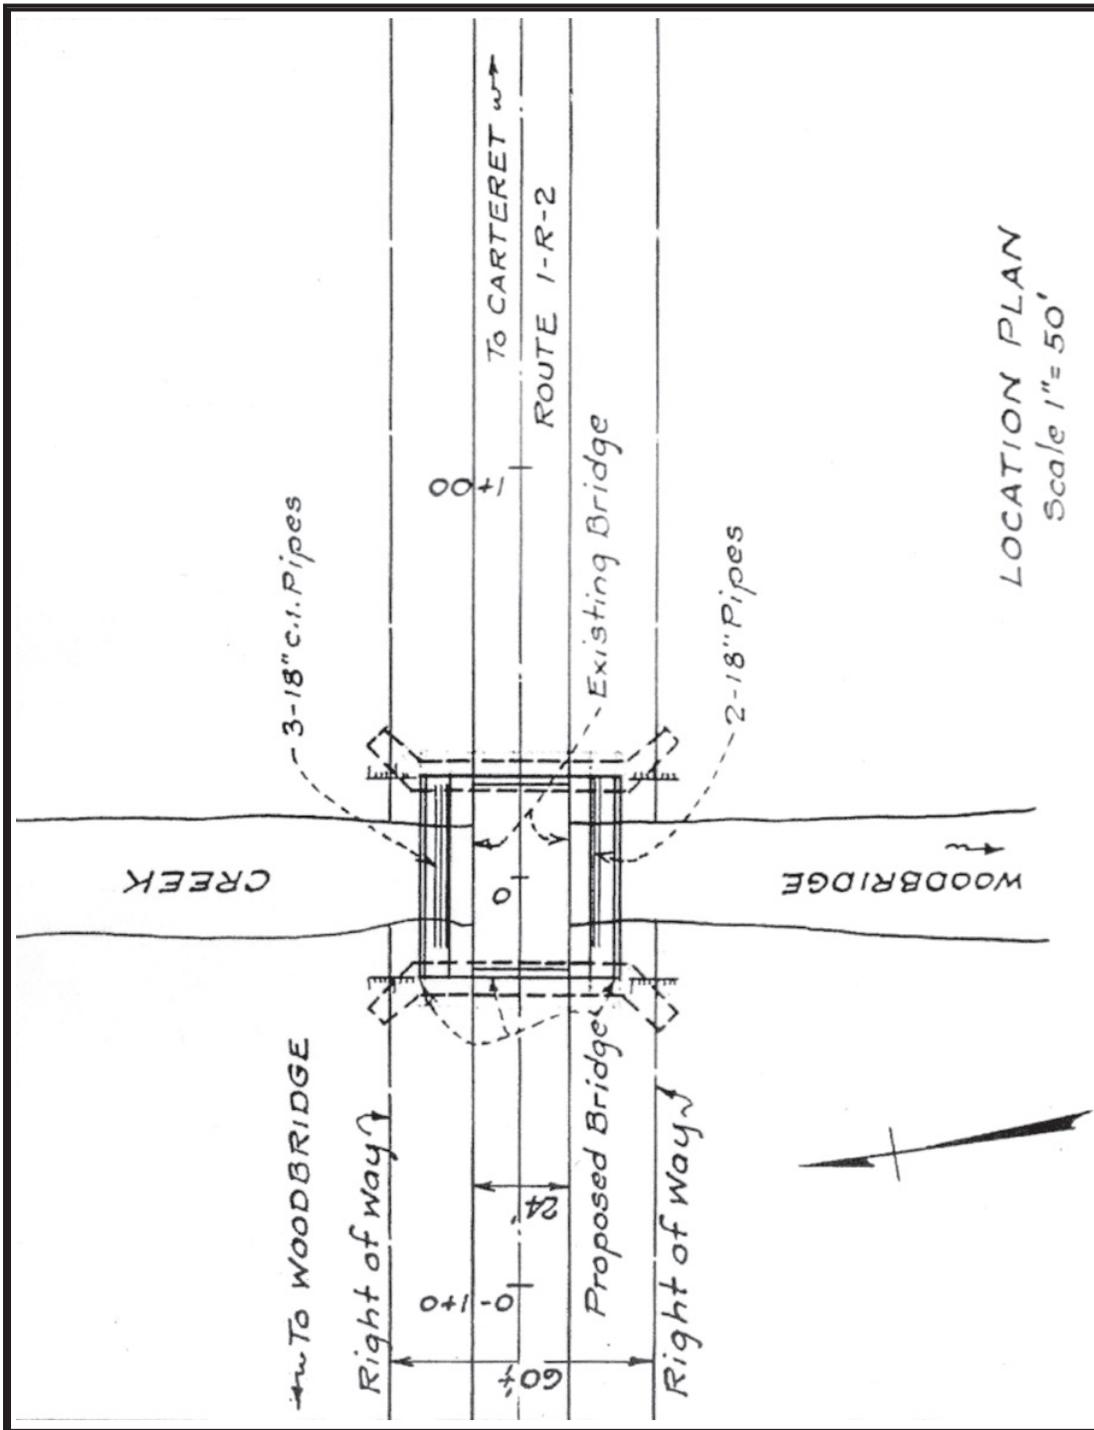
Plan of Proposed Concrete Bridge 1-B-17 and Predecessor Bridge in 1938. (Source: Middlesex County Engineer Department).
